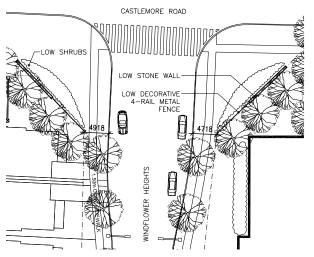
Concept Neighbourhood Gateway at Castlemore Road & Windflower Heights
